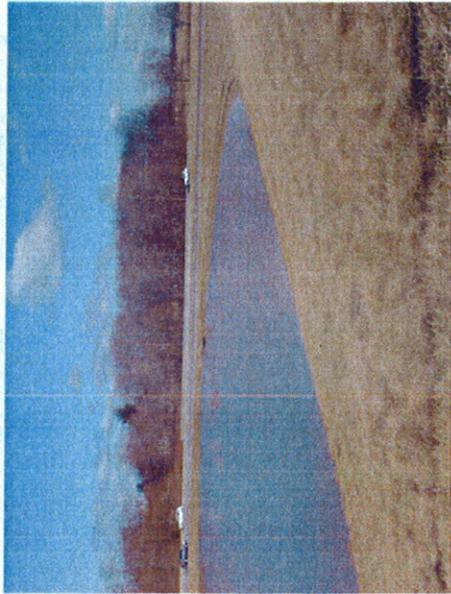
Facing northeast at outlet of structure beneath on/off ramps, before pipe cutting.
